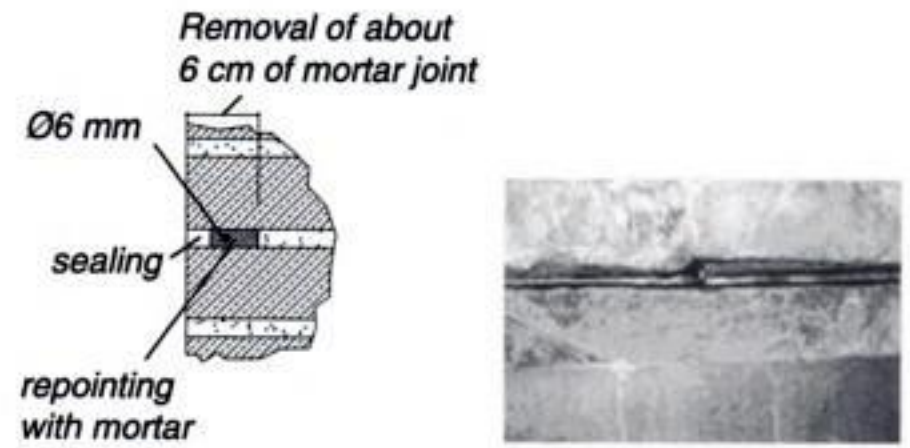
Bed joint reinforcement technique: scheme and detail of the reinforcement in a brick masonry wall by steel bars.
